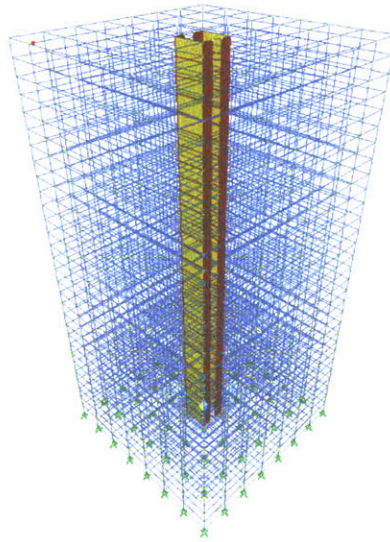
A 30-Story, 0-Degree C-Shaped Wall Pier Building
